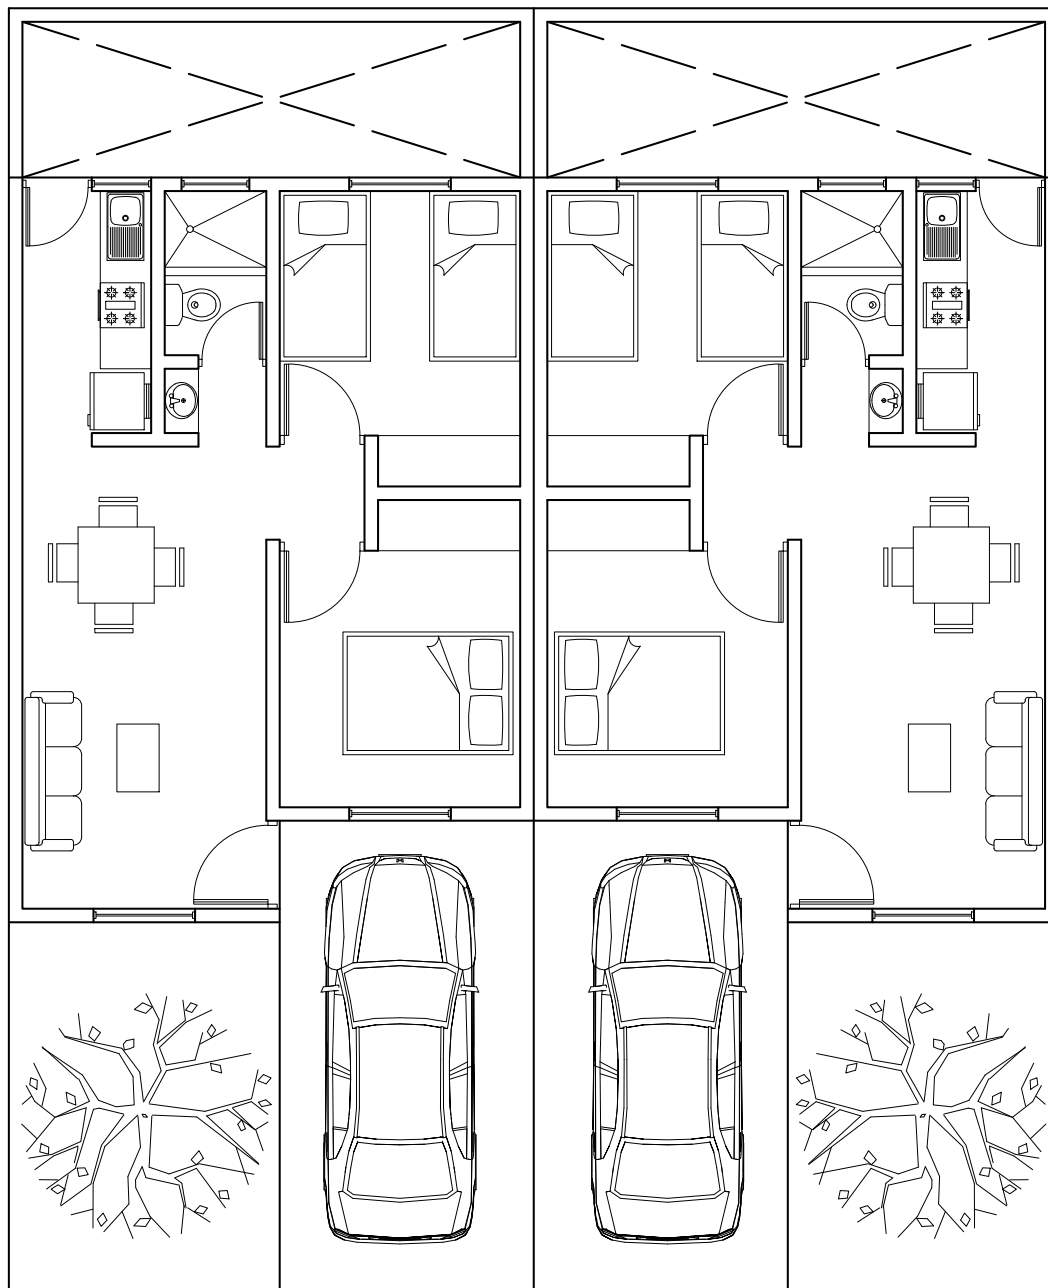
Floor Plan (54 m²) Diagram of Houses in Brisas de San Nicolas (Elaborated by the author)
